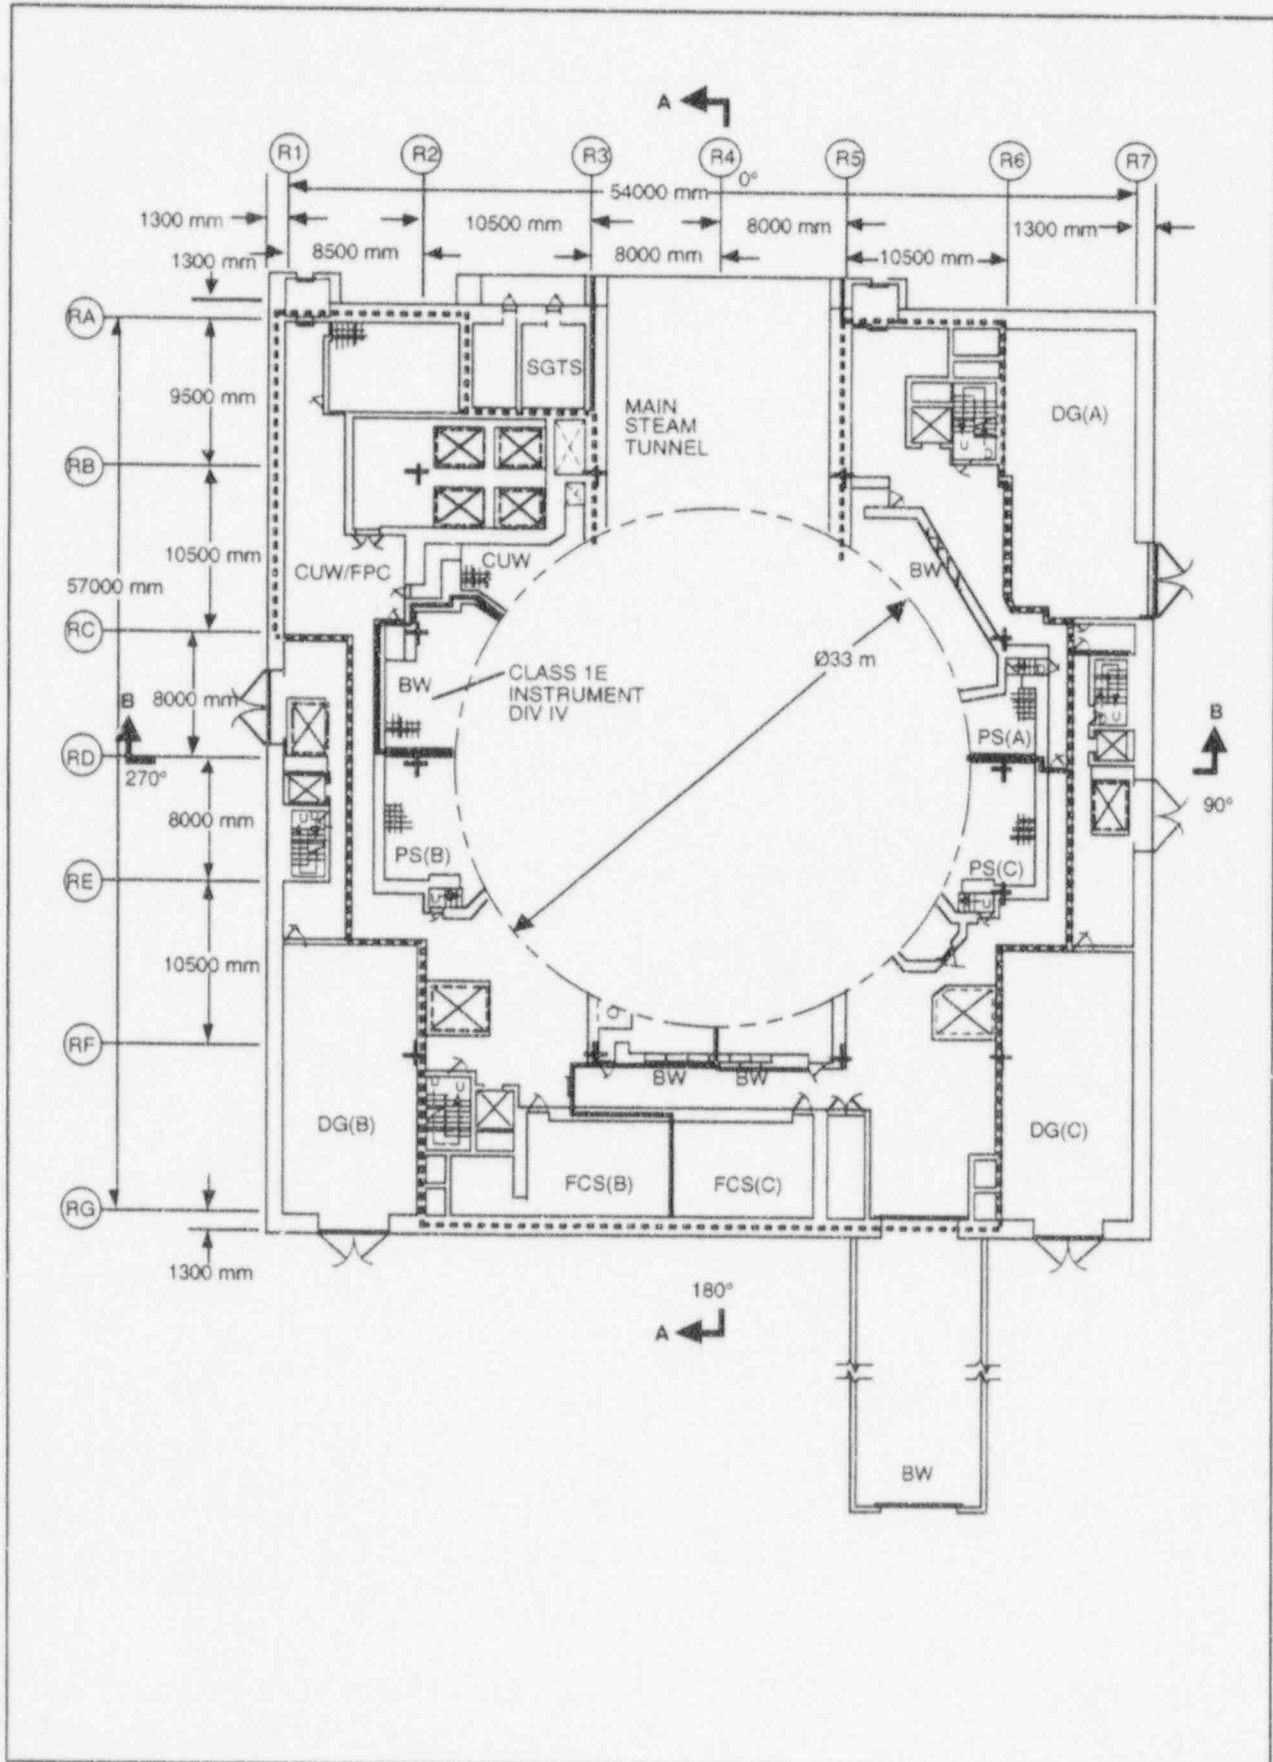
Reactor Building Arrangement, Floor 1F—Elevation 12300 mm
